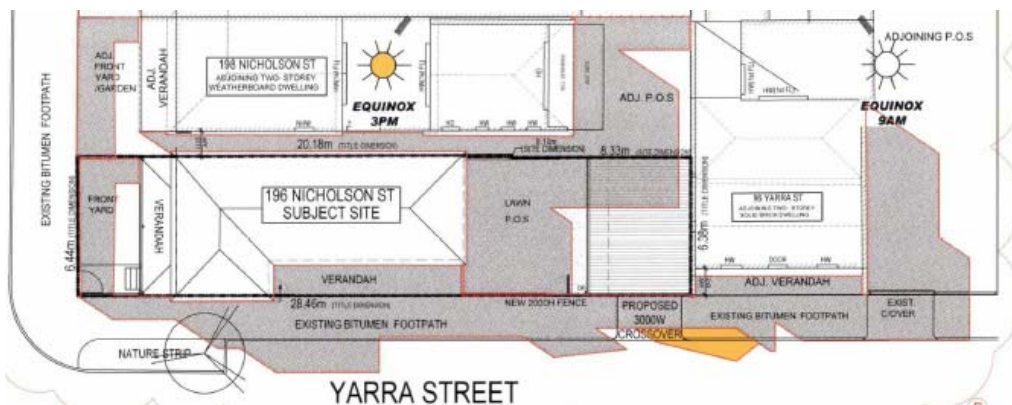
3pm shadow diagram – addition shadows shown in orange (Applicant Submission)
